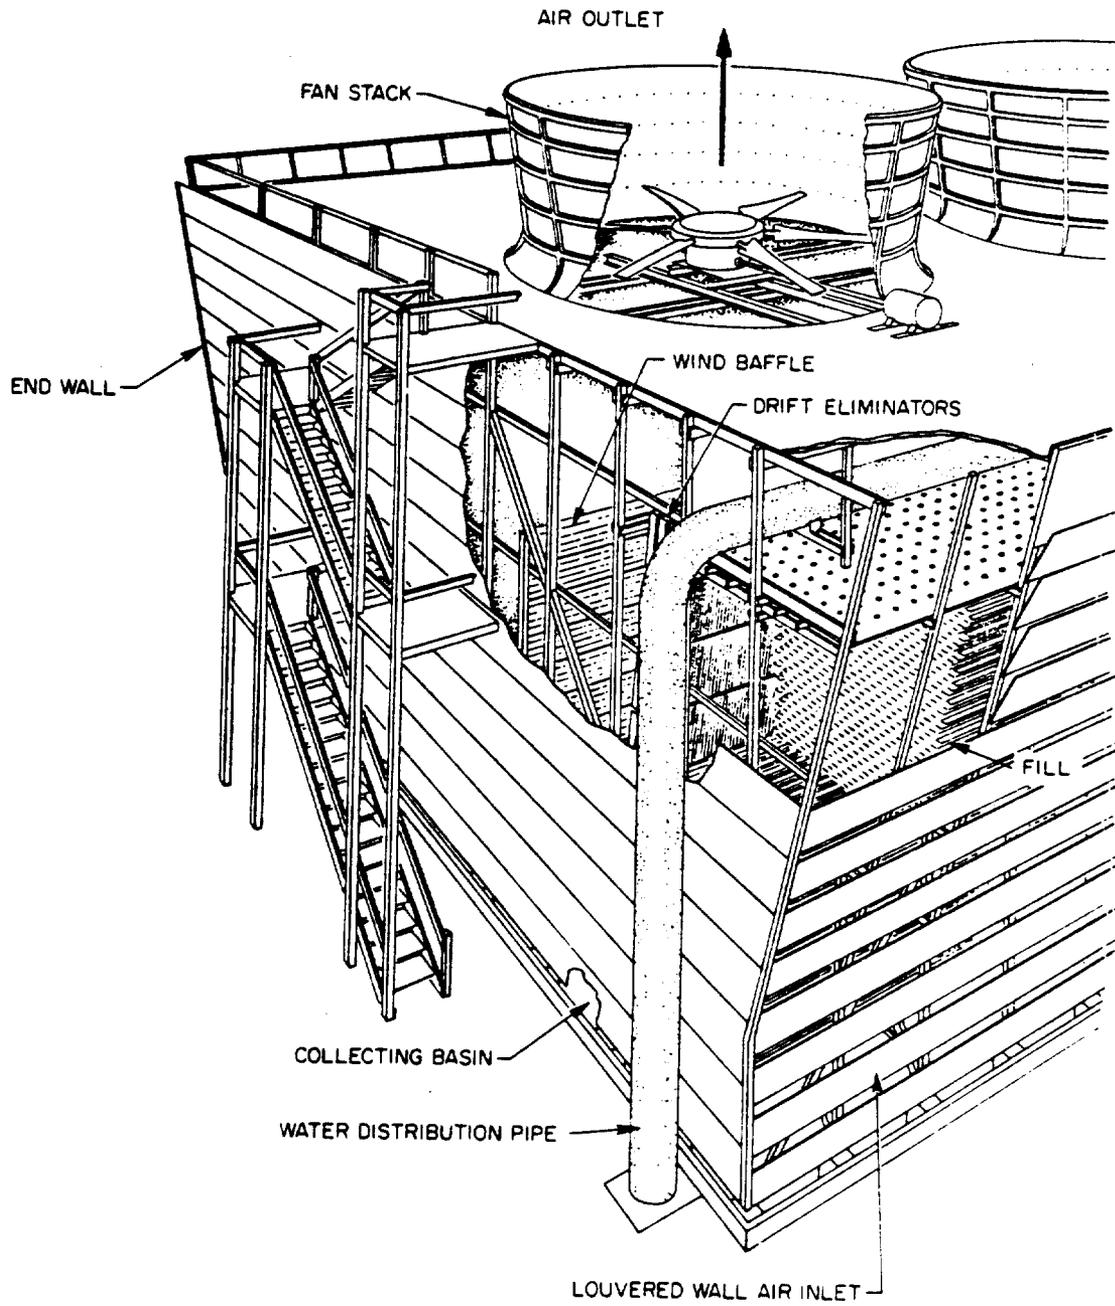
CUTAWAY DRAWING OF MECHANICAL DRAFT COOLING TOWER
